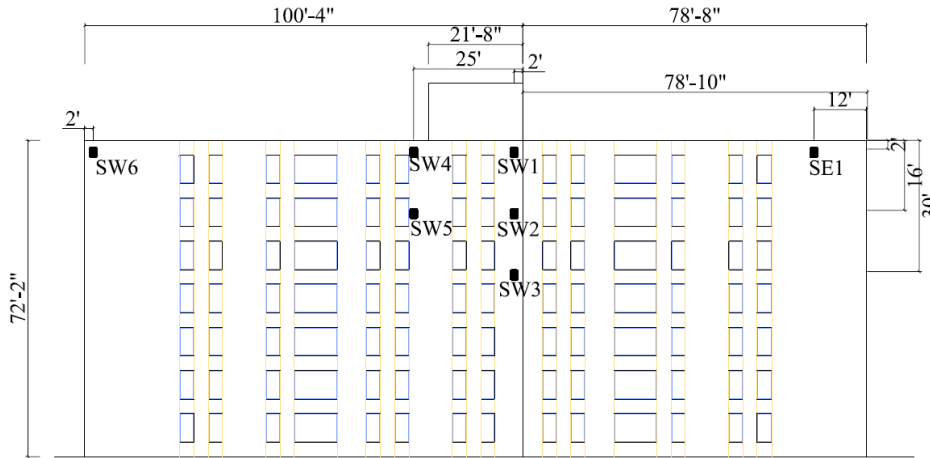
South-west elevation of McLeod House with the driving rain gauge locations
